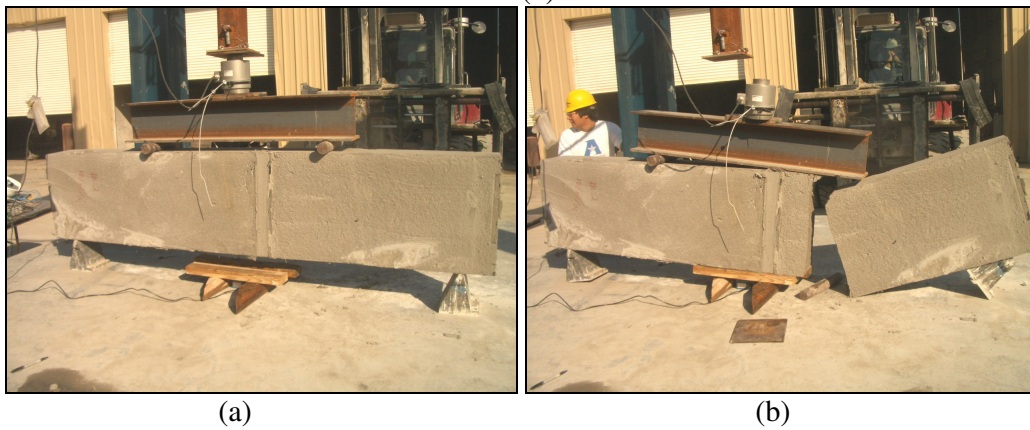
Beam for 2<sup>nd</sup> batch concrete cast on 10/31/06 for 7 day test;
